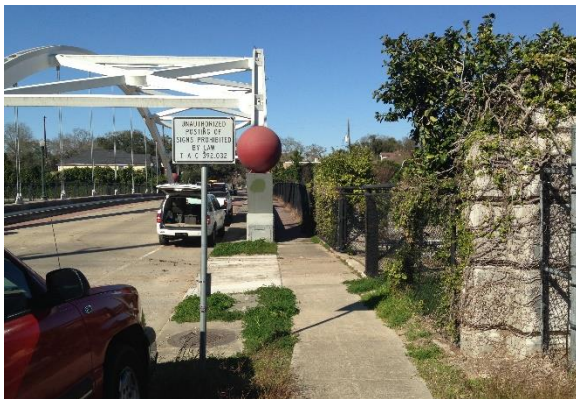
Sidewalk along Woodhead Street Northbound Facing North
